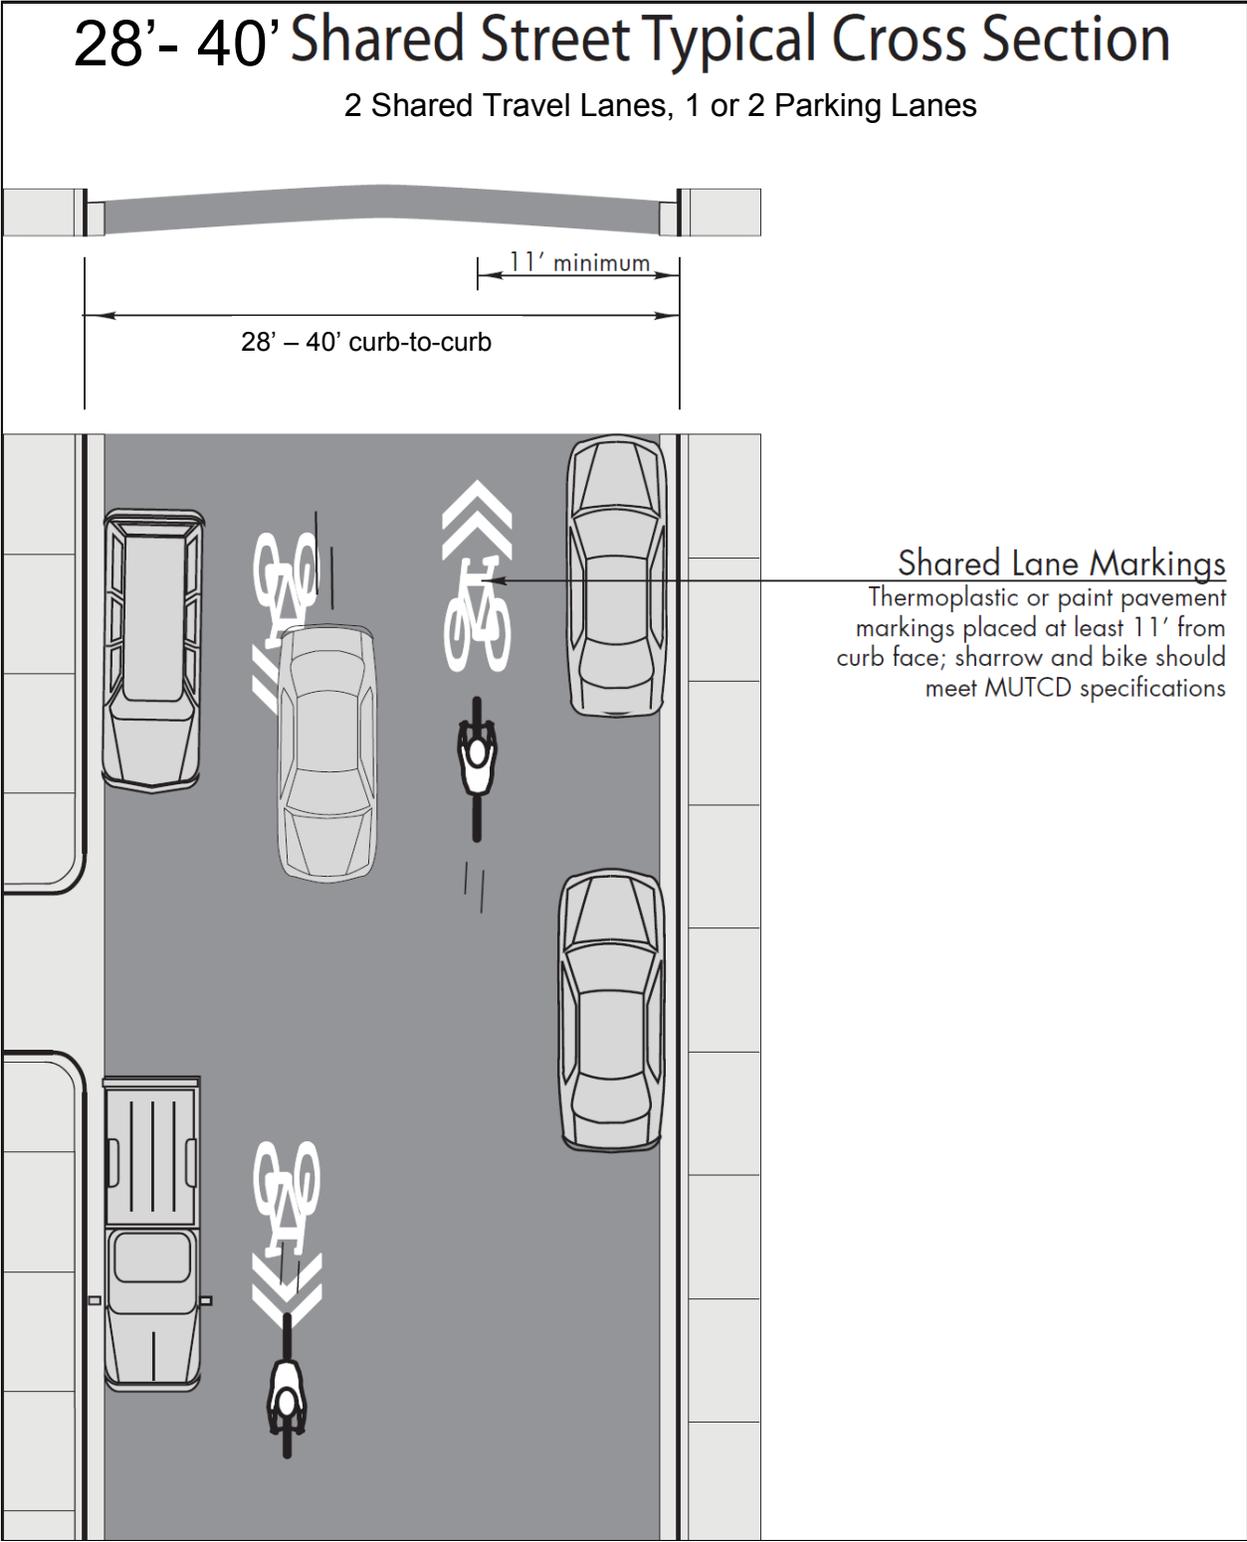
Typical 28' - 40' Wide Shared Roadway Cross Section
